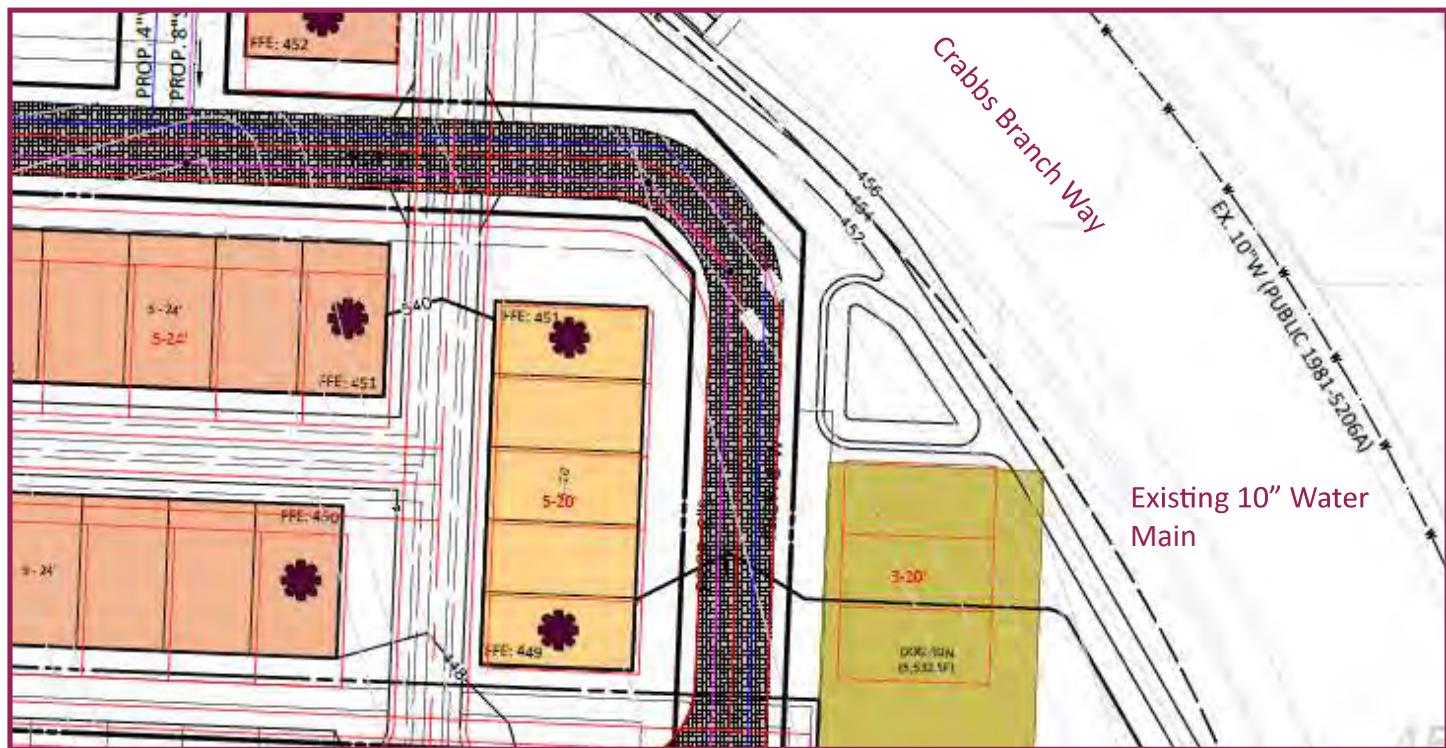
Existing Water Main Location (with Proposed Site Layout)
